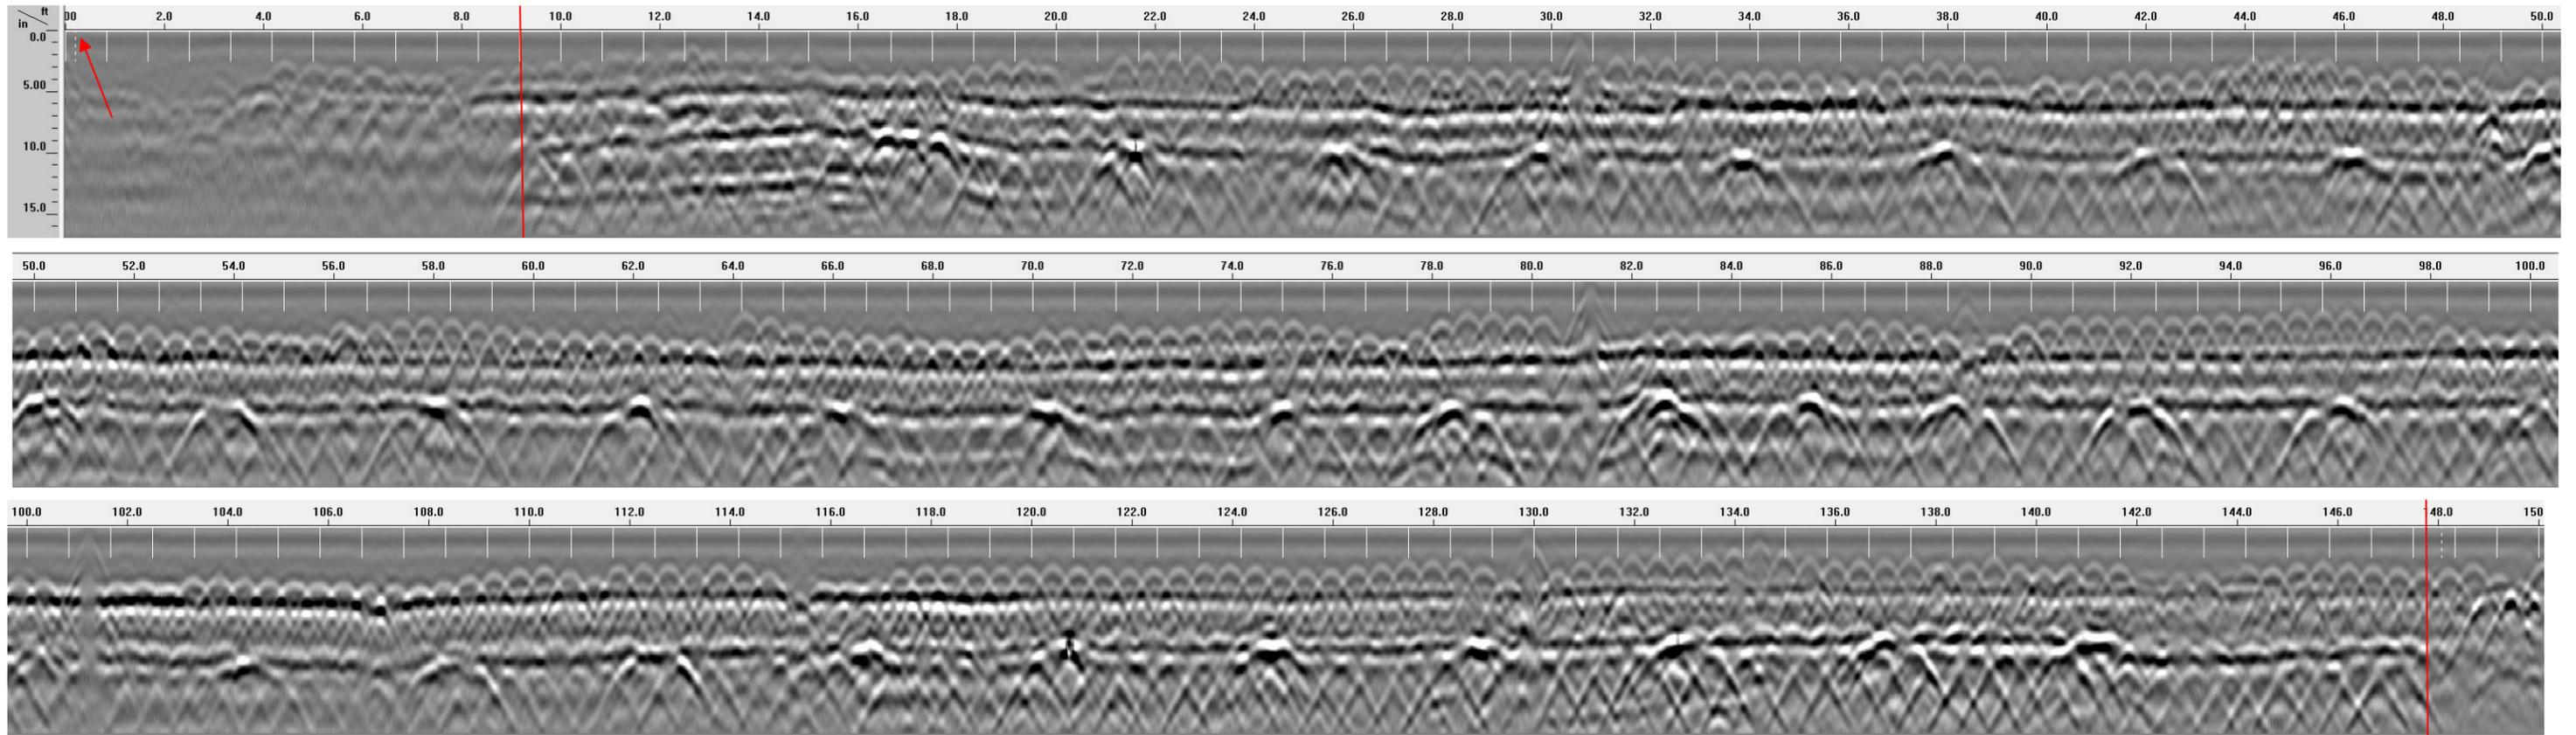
GPR profile F020.dzt along the front of the City Hall annex building parallel to Main Street. The typical transverse rebar (arches) is shown as well as the bottom surfaces of the topping slab and structural deck. This image also shows the position of the basement spaces relative to the sidewalk. The first set of red lines in the upper image show the extent of the smaller basement (about 10 feet). The next set of red lines in the lower image show the extent of the larger basement (about 18 feet).
